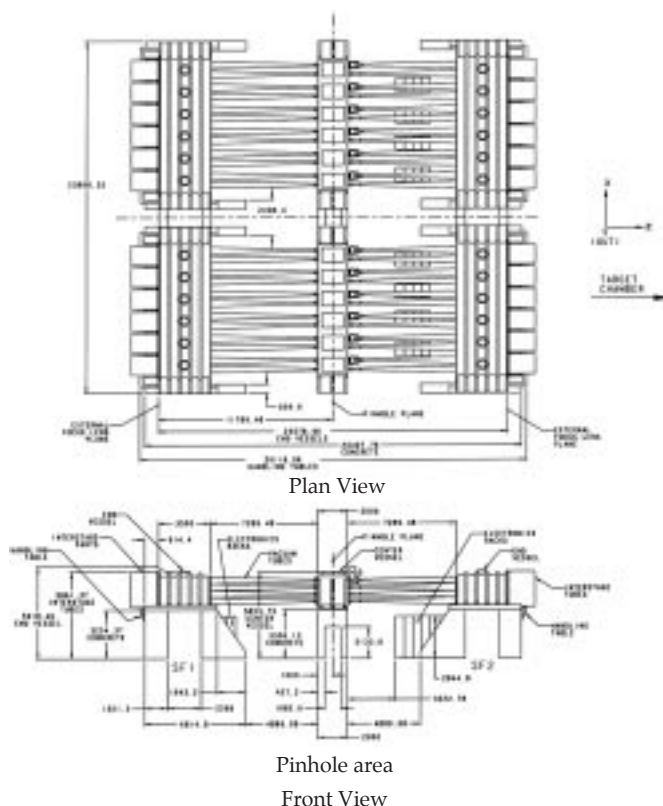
Plan and elevation of the CSF support structure. (40-00-1097-2297pb01)
